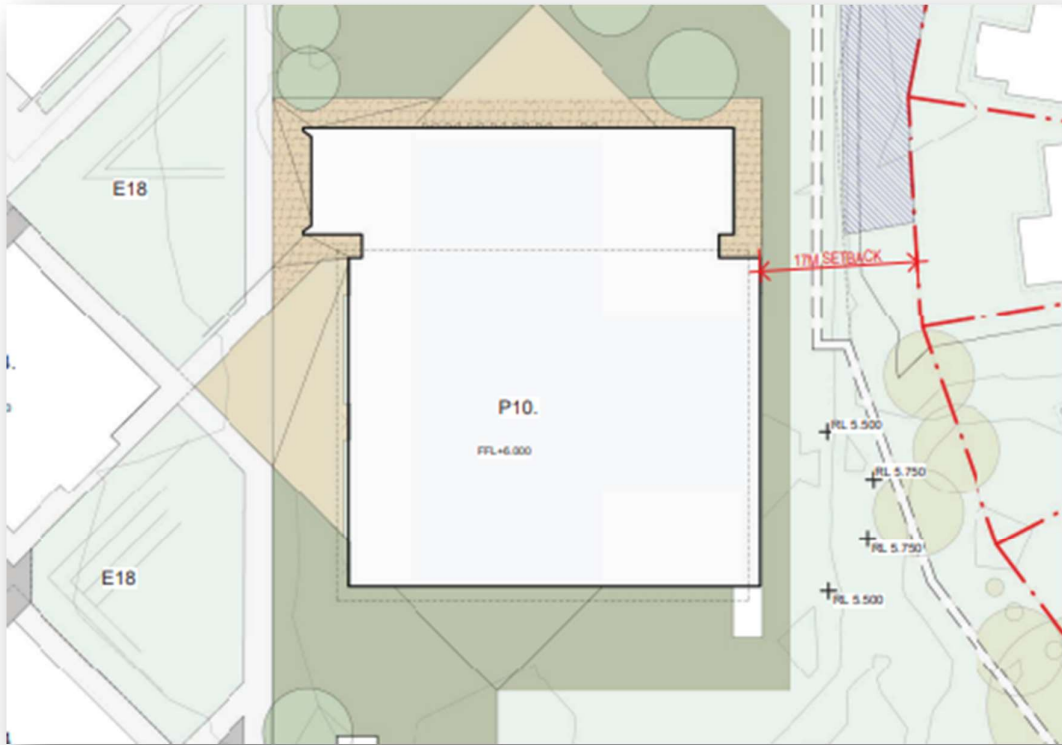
Extract from Front of Campus Site Plan (Drawing No DA-11-21) showing the proposed Sports and Recreation Centre (P10) and the minimum 17 metre setback to the property boundary (Source: Cox Architecture 2022)
